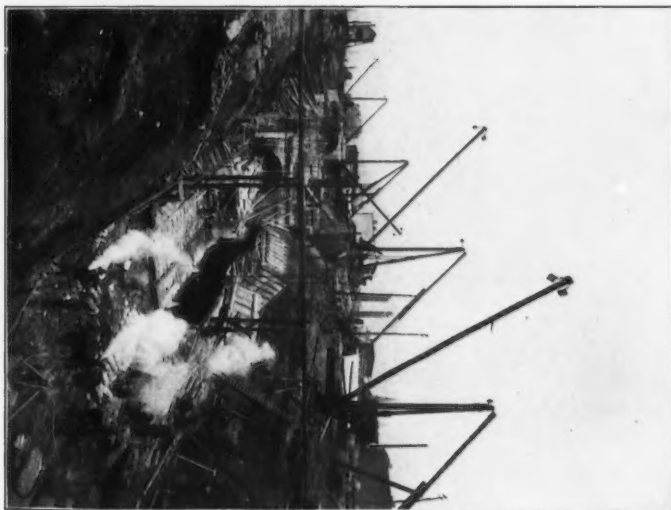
TUNNEL C CROSSING TUNNEL B.
